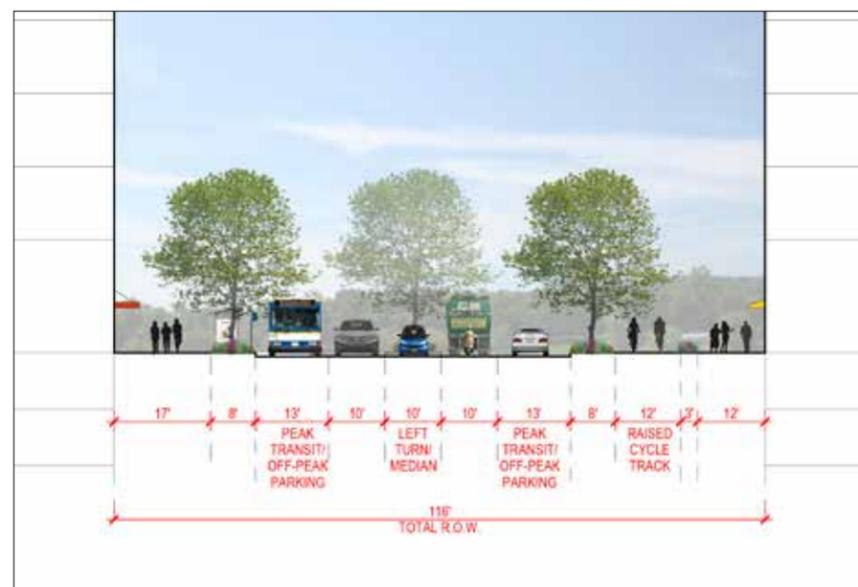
Cross section showing improvements to Eisenhower Avenue - "A" street
